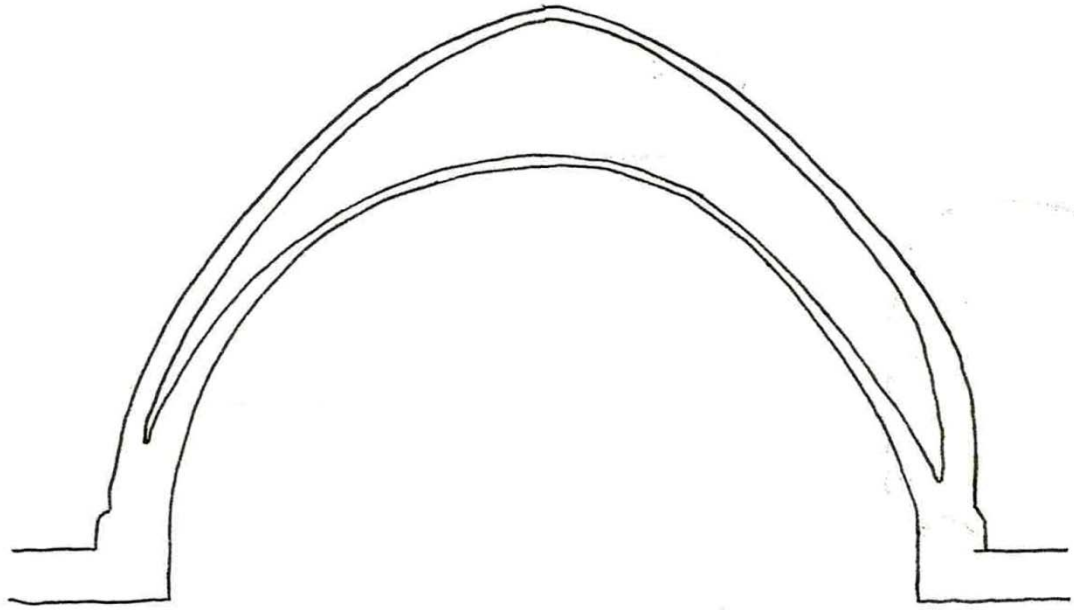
Sketch of a double layered brick dome, (source: Author 2013)
